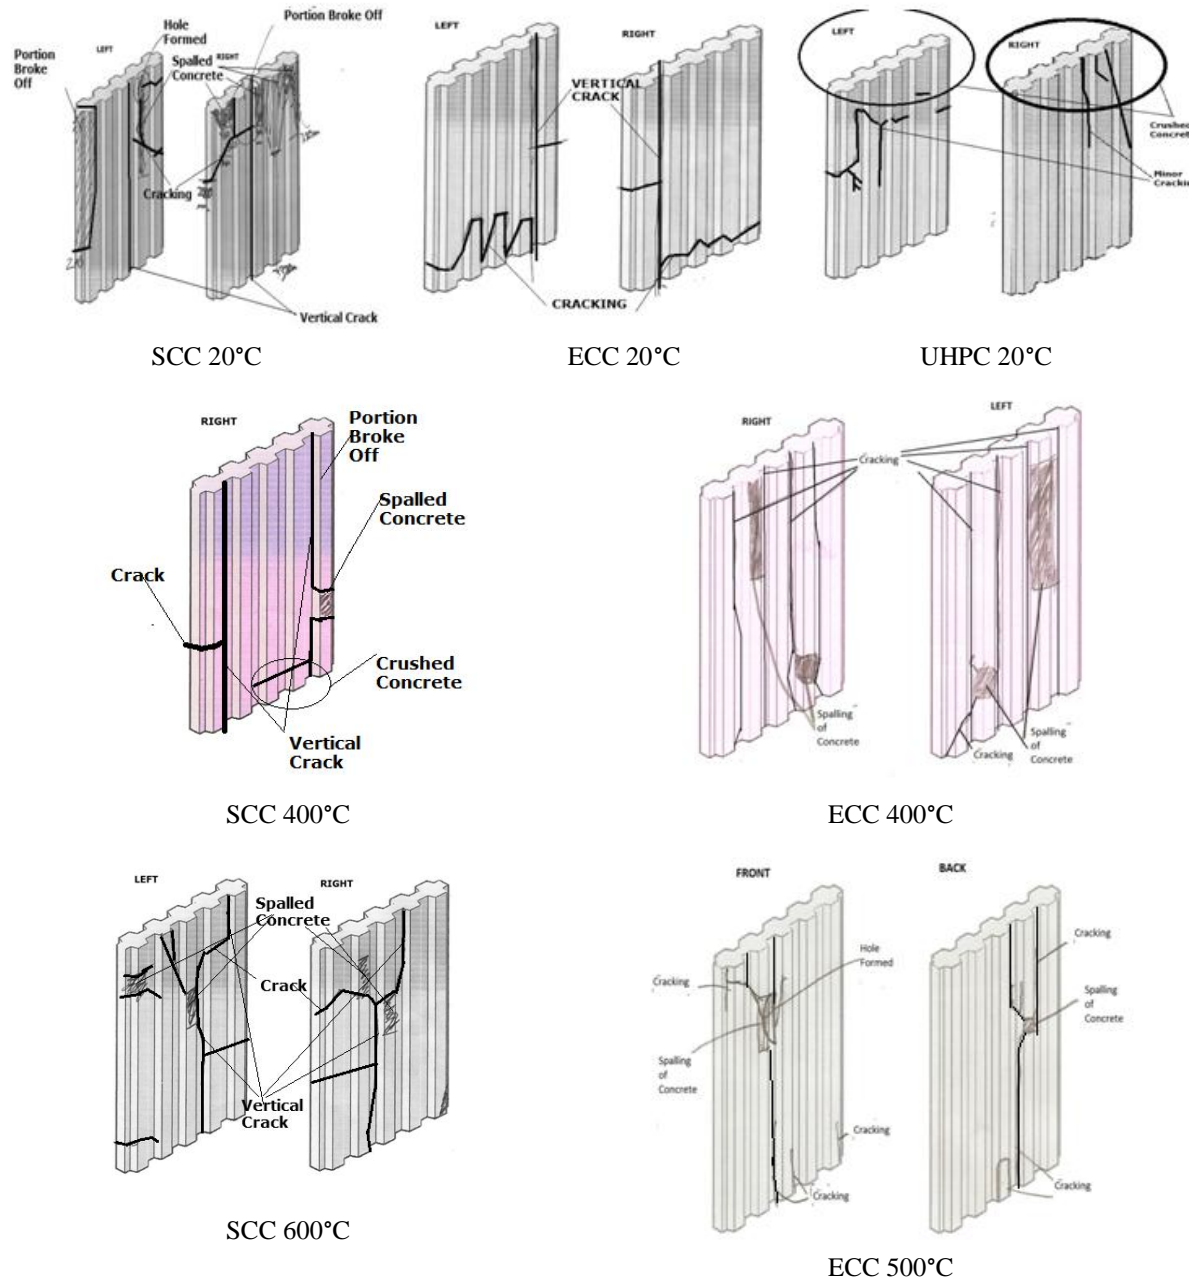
Failure diagrams for heated and non-heated profiled concrete walls
